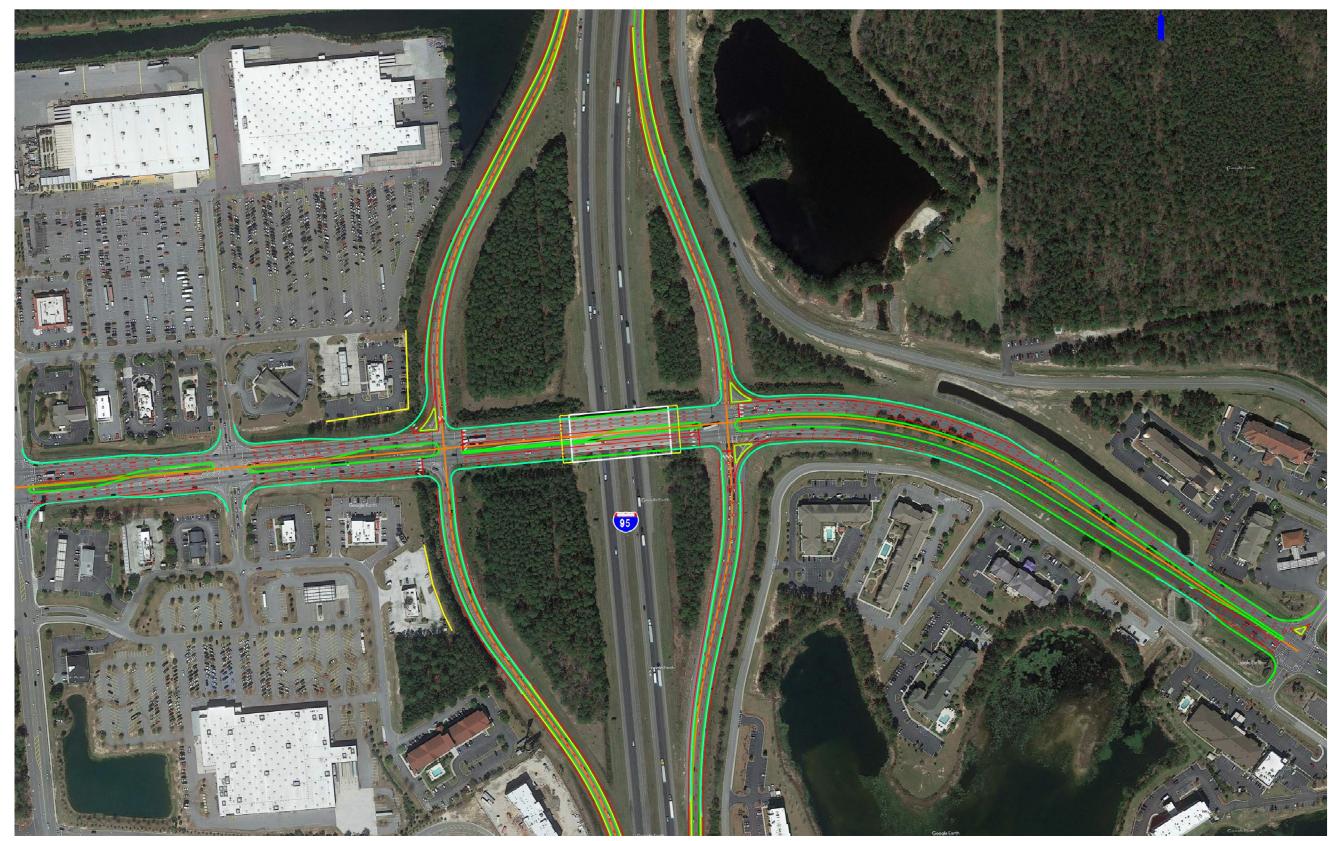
Interchange Alternative 1: Widen Existing Bridge & Ramps
